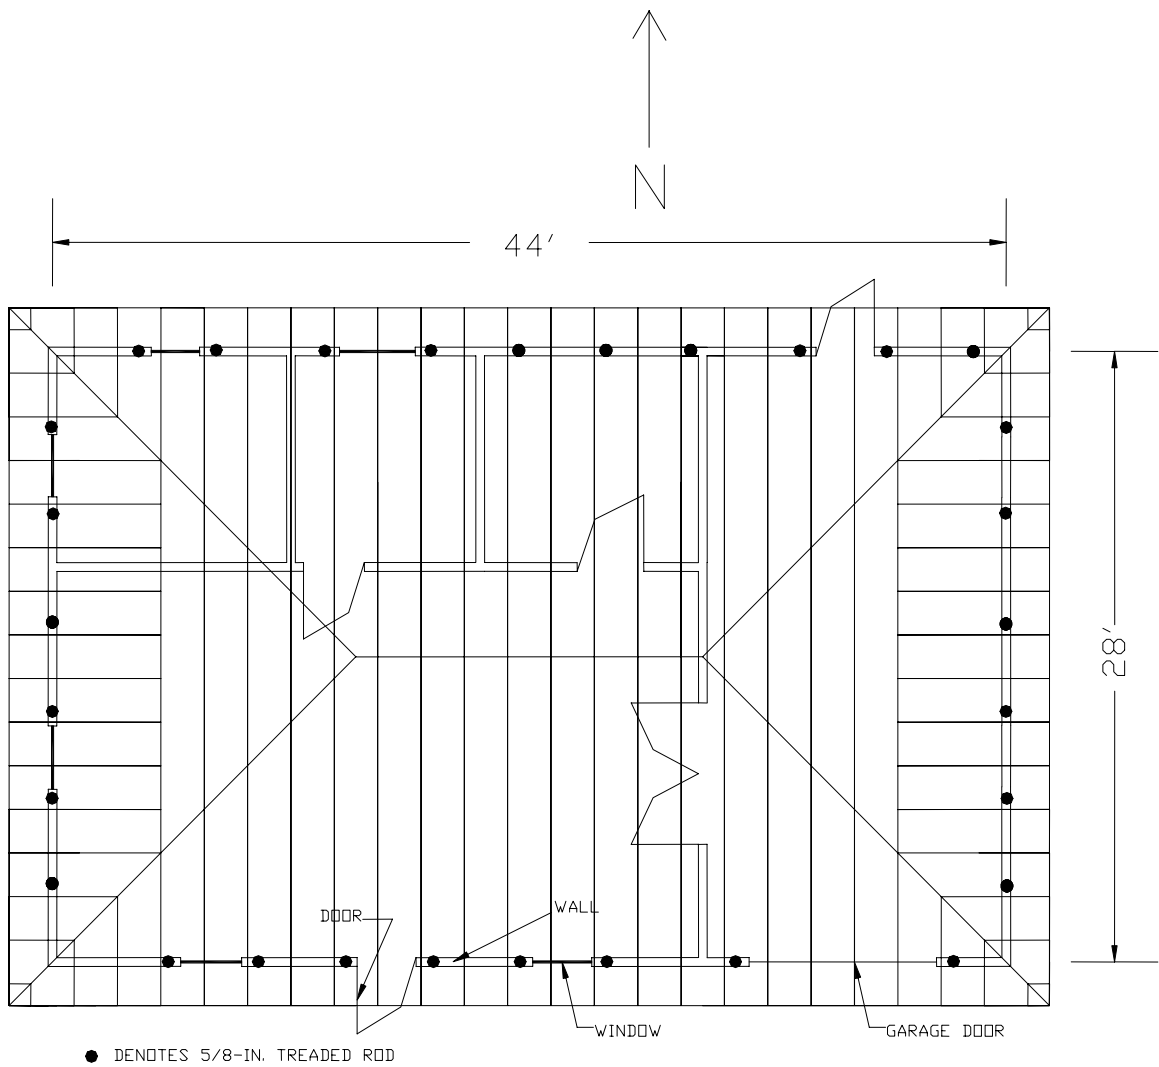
Plan view of test structure with treaded rods (FPL, 2006)
